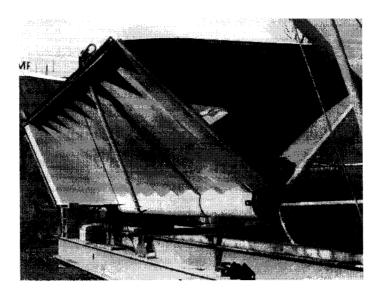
Use of TWP beams in Maupre Viaduct Bridge, Charolless, France
